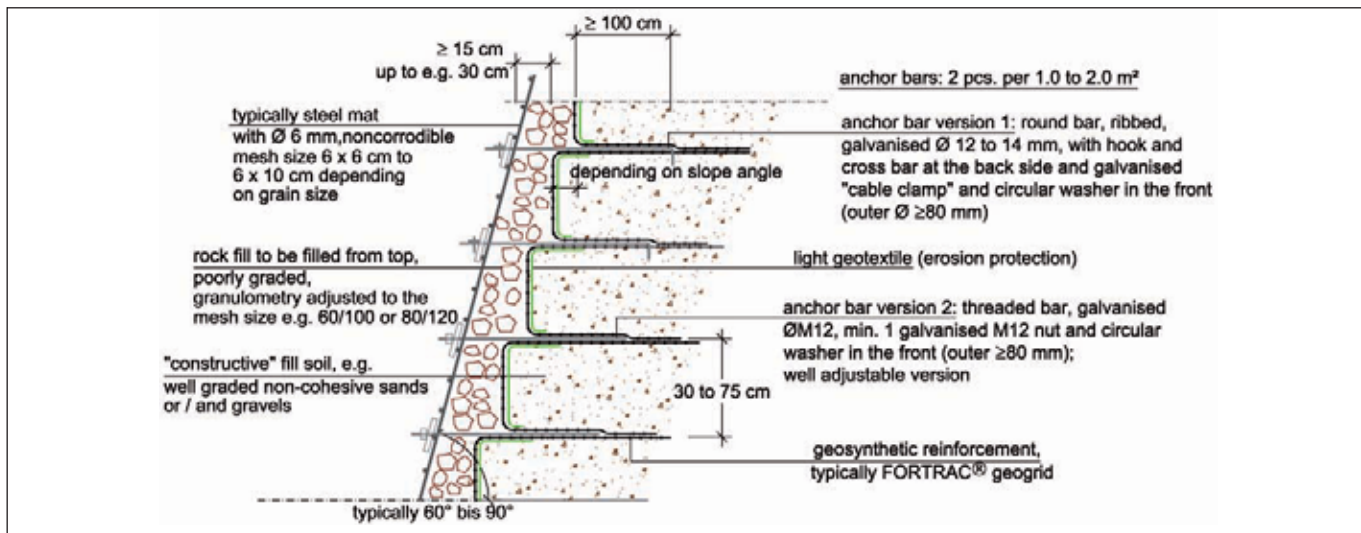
Typical Cross Section of the Muralex® stone facing system
